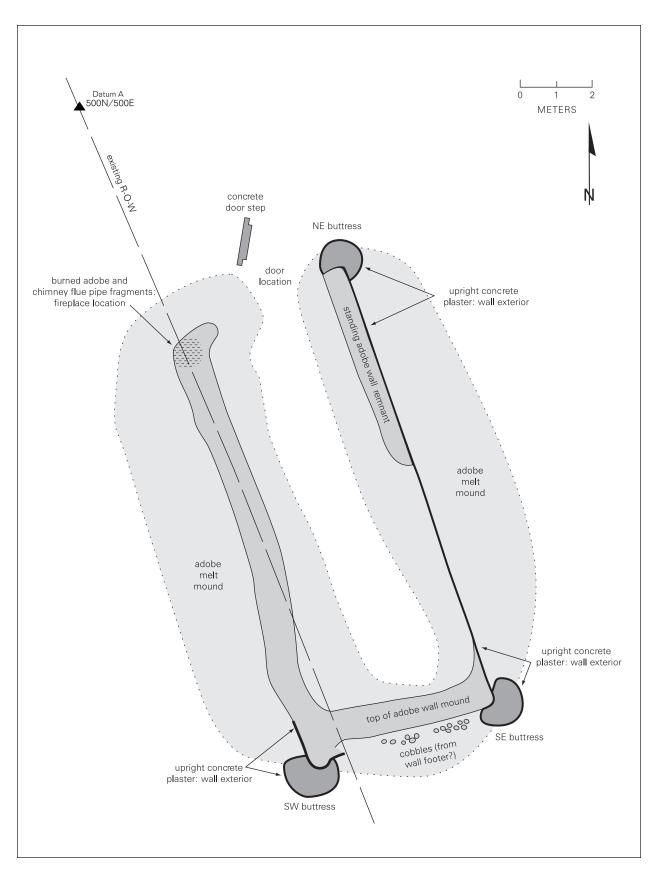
Plan of Structure 1, the Gavilan morada meeting house, LA 105710.
